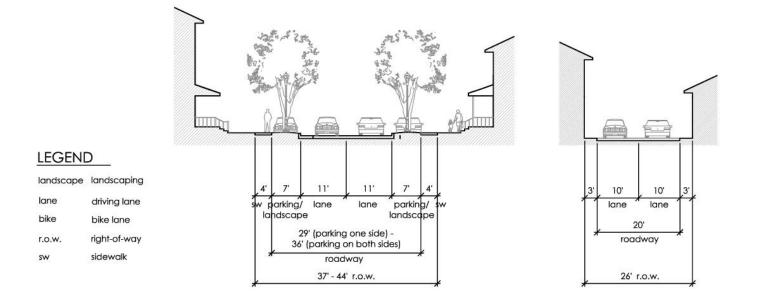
Typical Local Street (Parking on One or Both Sides)
